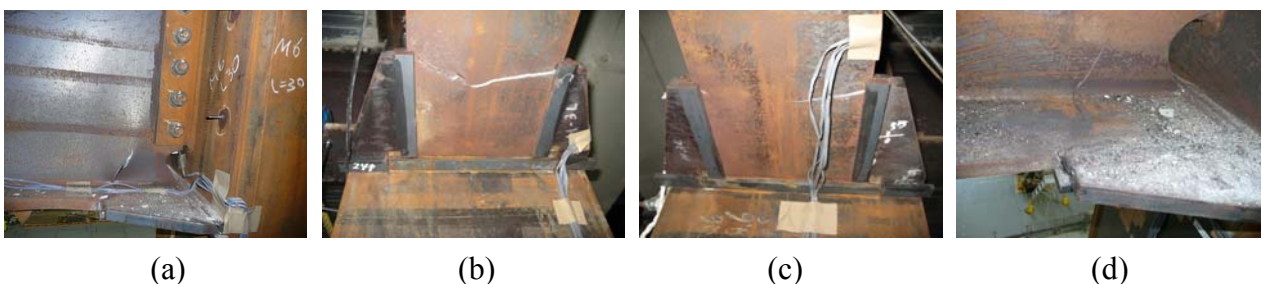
Fractures and cracks of the wing plate connections: (a) The third floor connection (SL);(b) The third floor connection (SR);(c) The third floor connection (NL); (d) The forth floor connection (EL)
